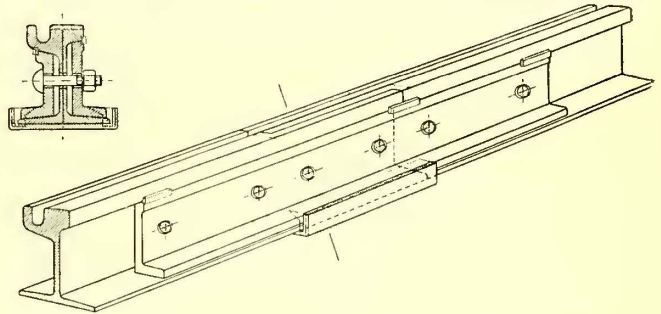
Berlin Rail Welding—A Repaired Mitered Joint.
